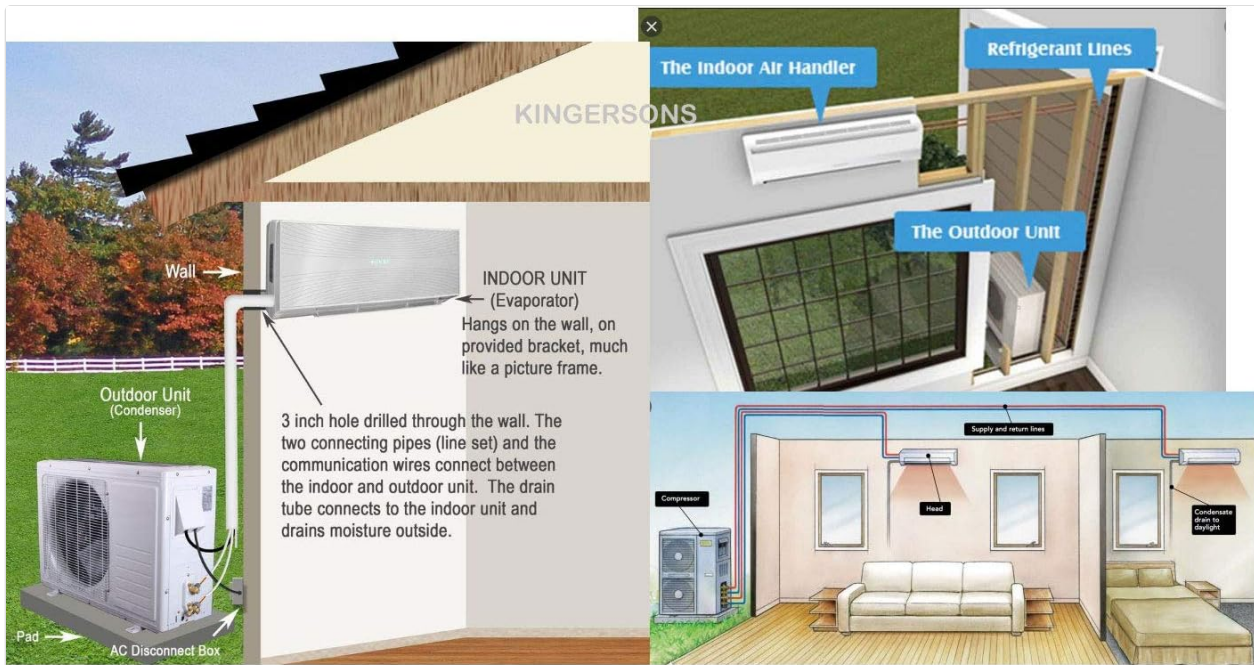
Typical installation diagram showing the connection between indoor and outdoor units.
